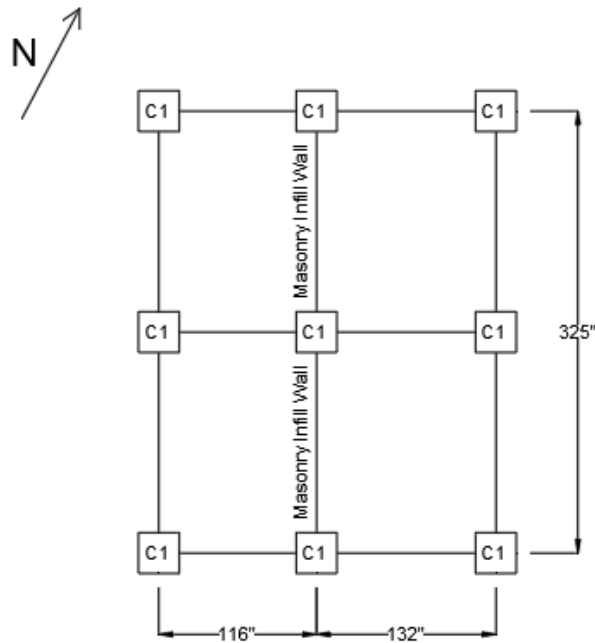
Gongabu Bus Park Building 2A floor plan showing lateral resisting elements on the eastern wall of interest
